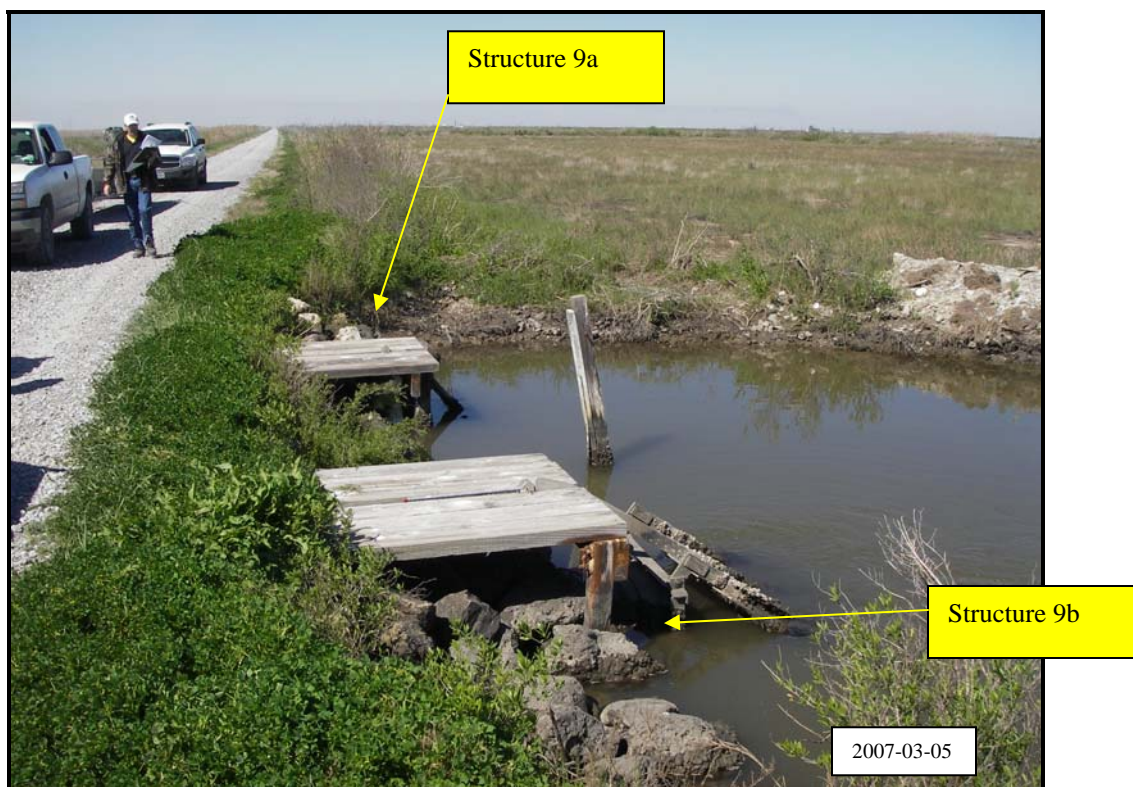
, Structure No. 9a & 9b, showing outlet pipe flap gates.
